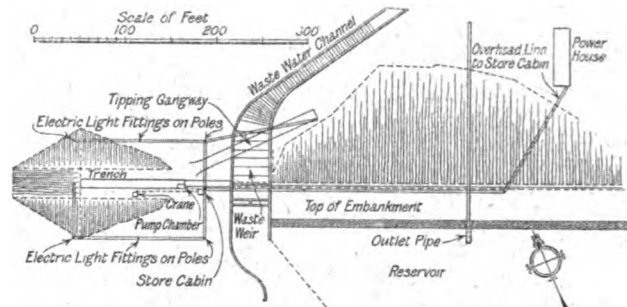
GENERAL PLAN OF INSTALLATION.
